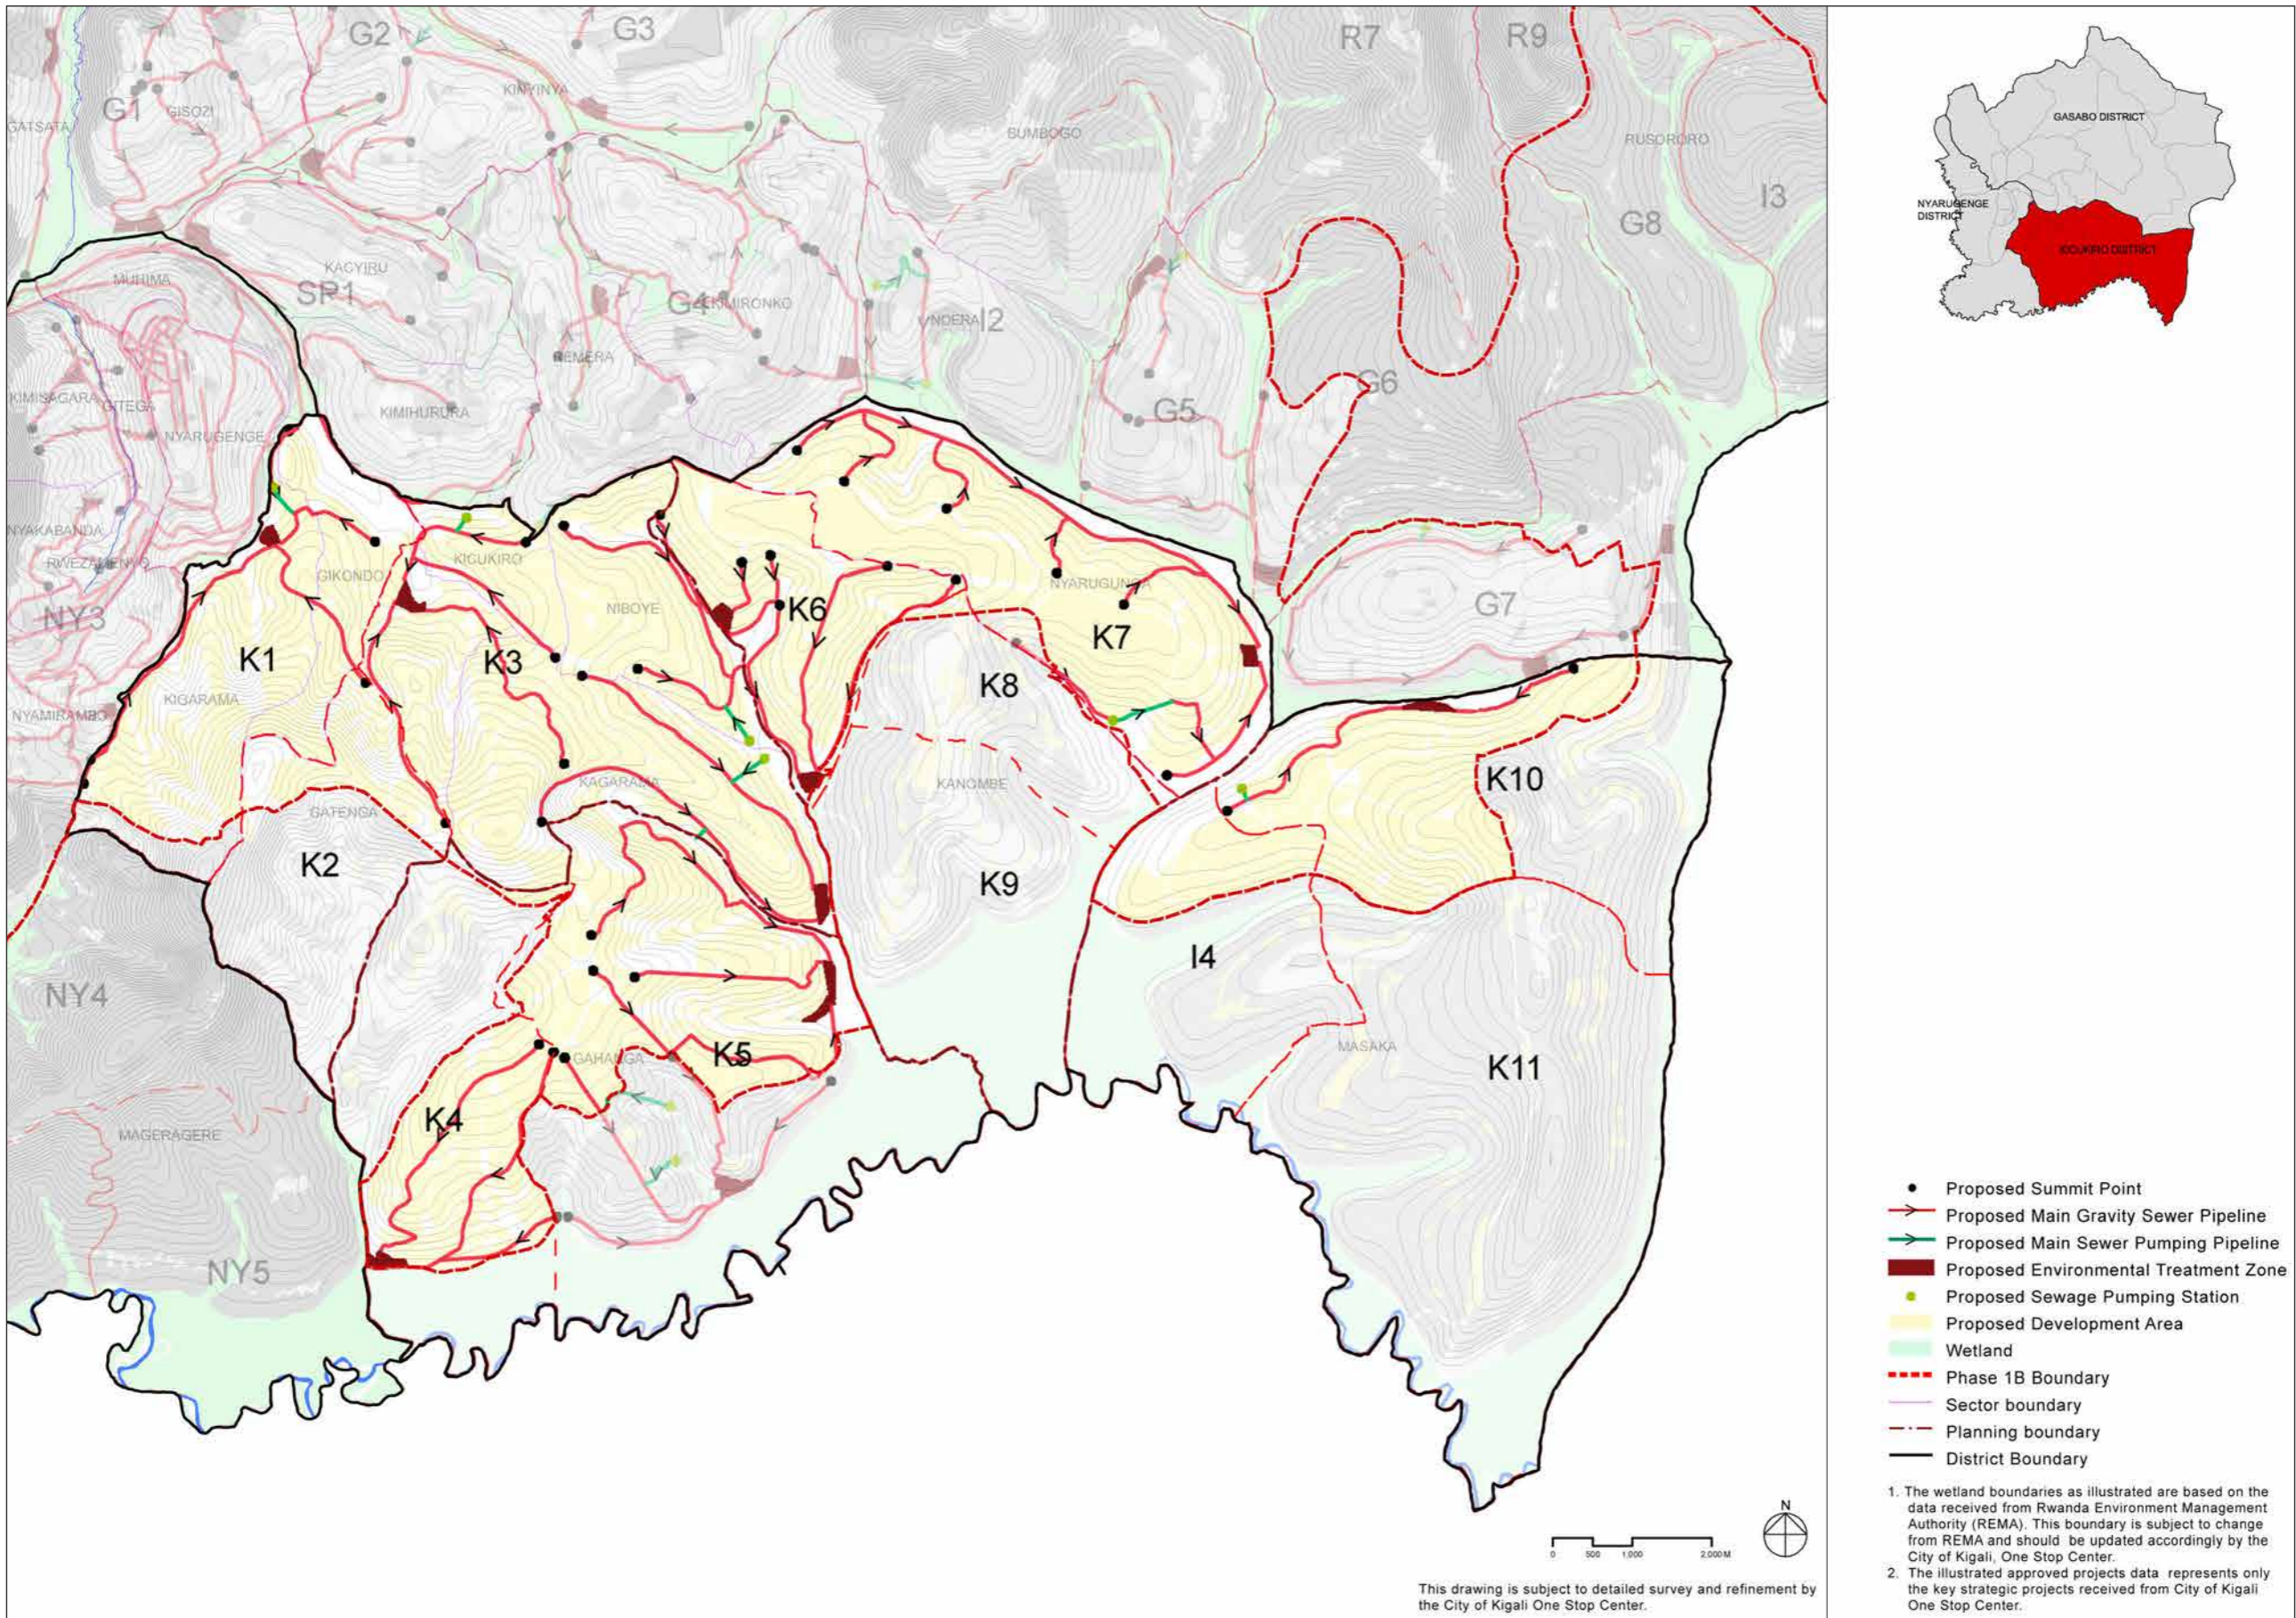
Kicukiro District - Proposed Sewerage Plan - Year 2025
